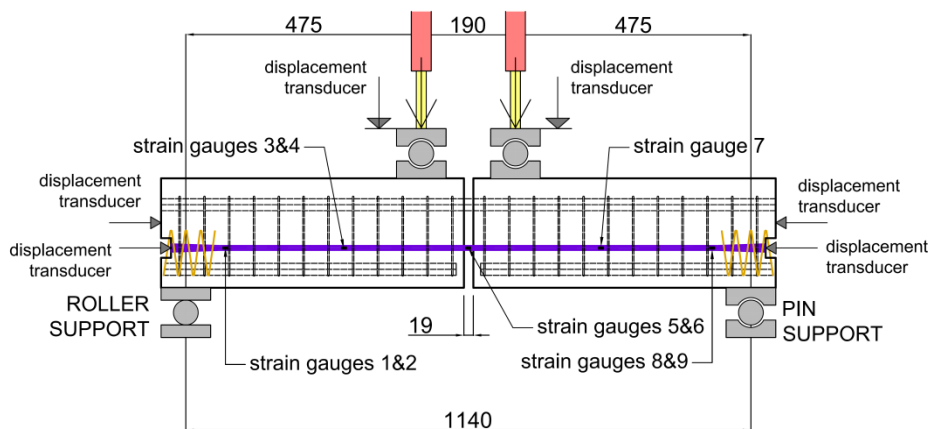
Preliminary test set-up (all dimensions are in millimetres)
